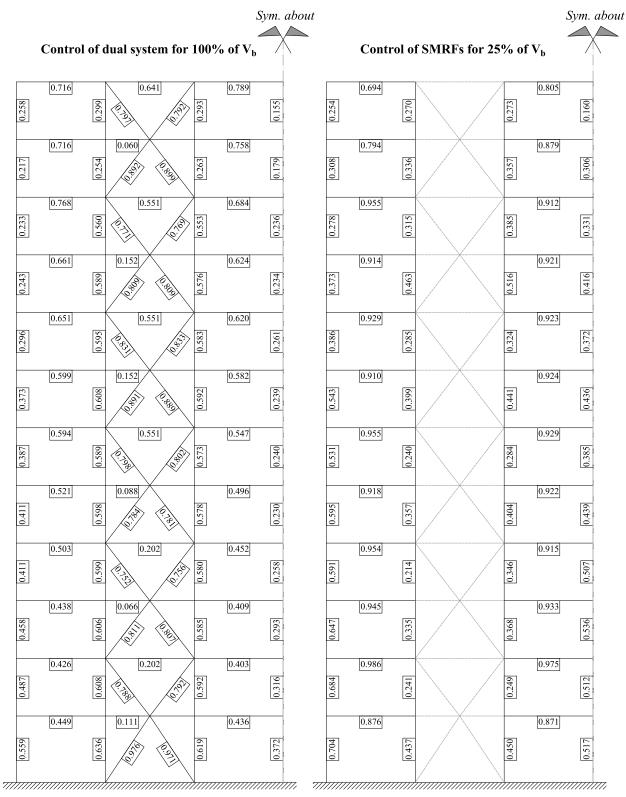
The P-M ratio of designed cross-sections of 12-Story building archetype
